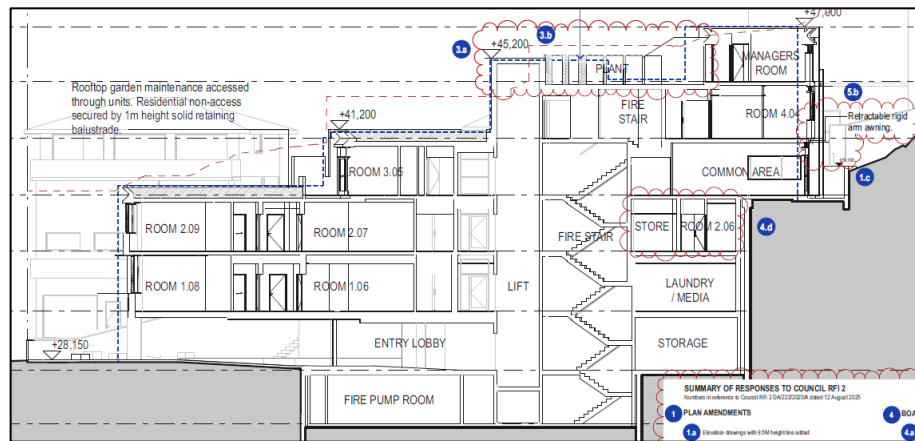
Proposed long section (Source: TonkinZulaikhaGreer)
